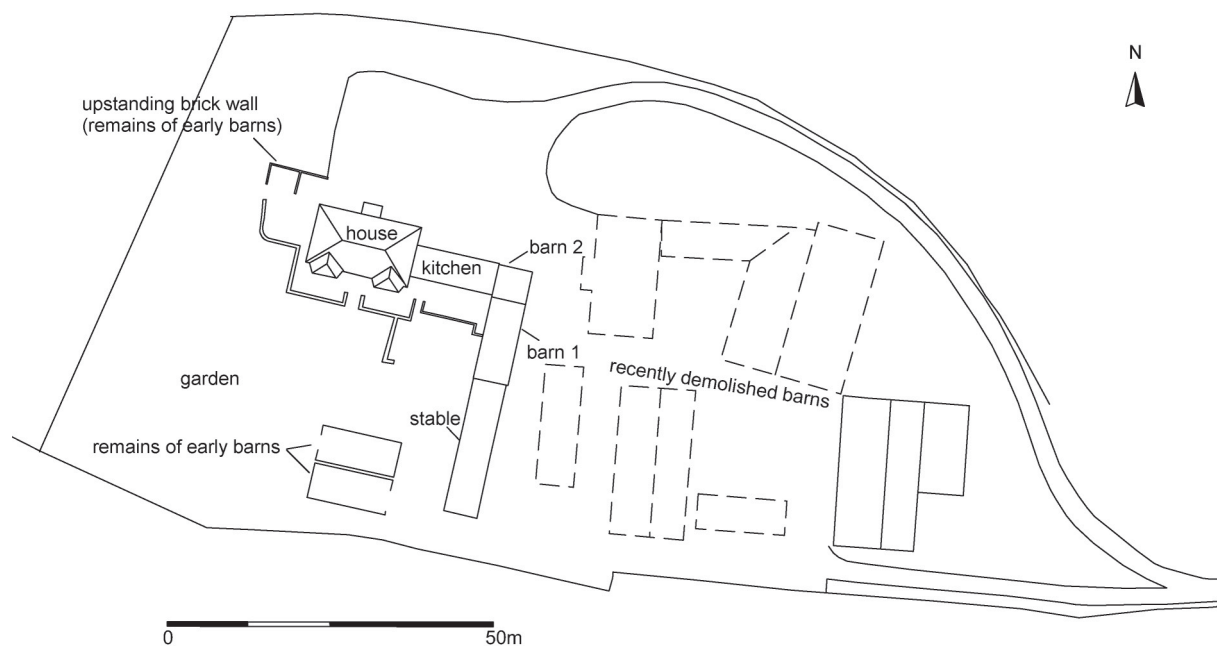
Site plan showing barn 1 and 2 in relation to surrounding buildings (adapted from plan supplied by BRP Architects)
